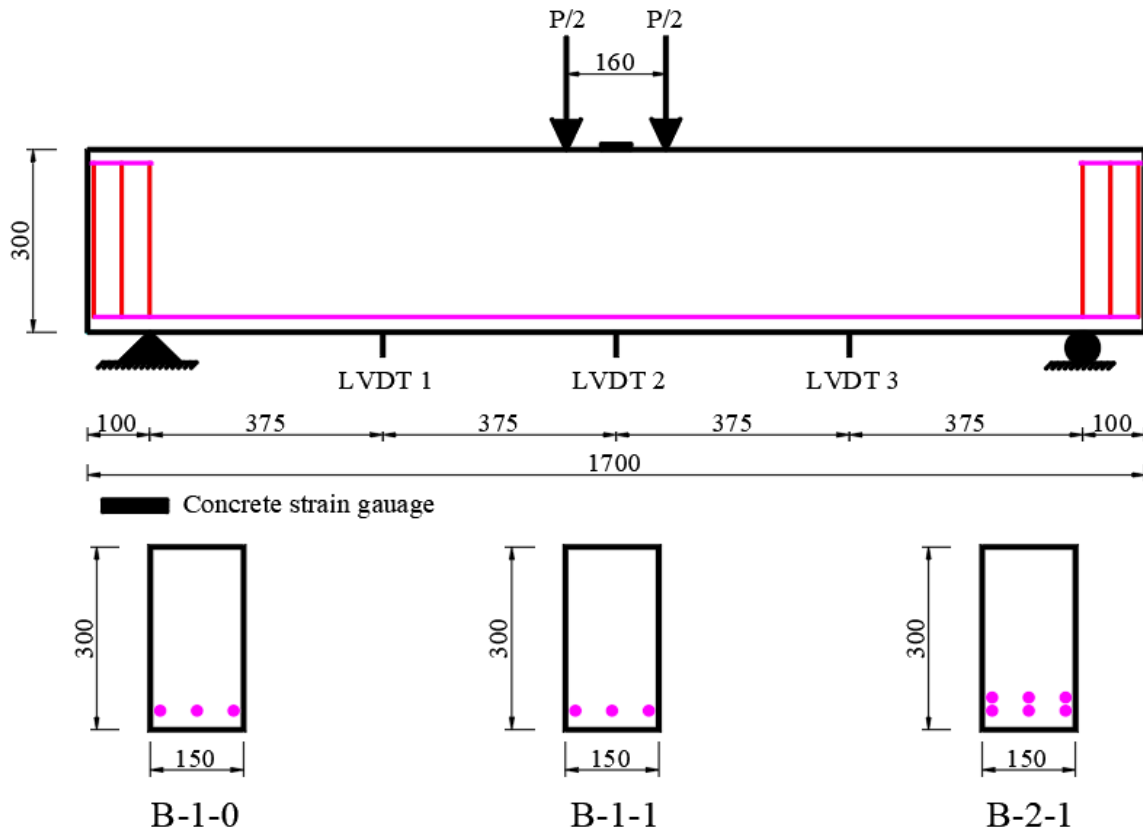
Dimensions, reinforcement details, and strain gauge locations of the test specimens (Note: dimensions in mm).
